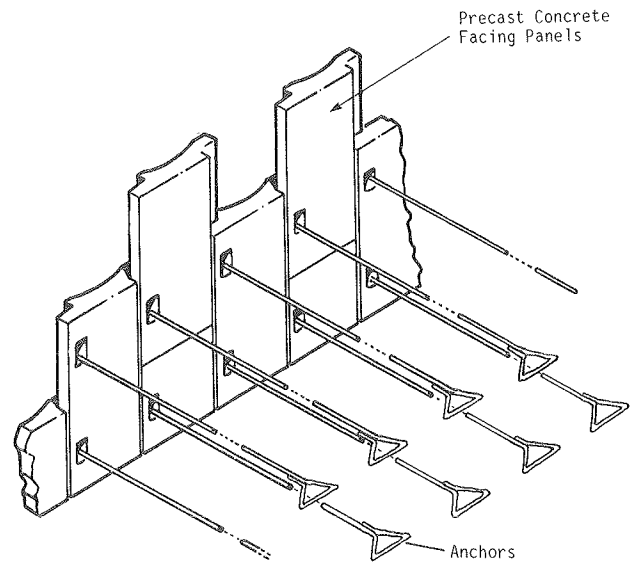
Schematic diagram of an Anchored Earth retaining wall. (Source: Ref. 6)
